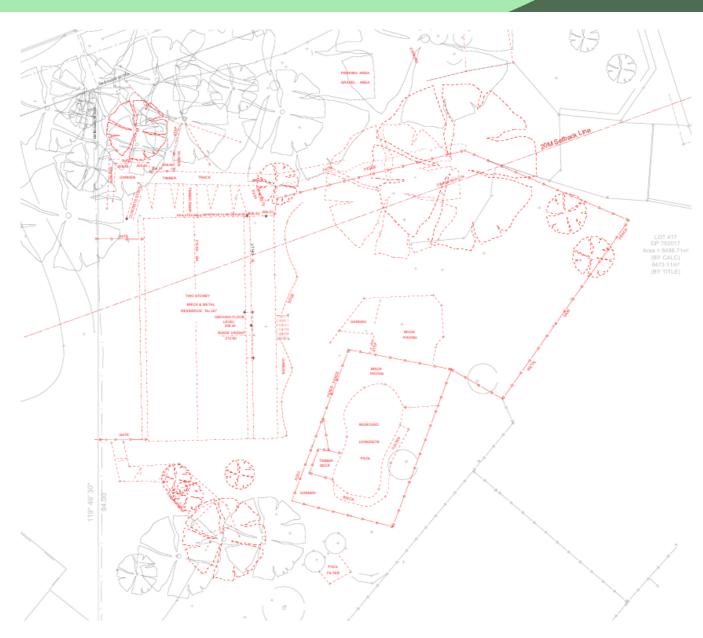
Demolition Plan. Source: Playoust Churcher, 6/2/25
